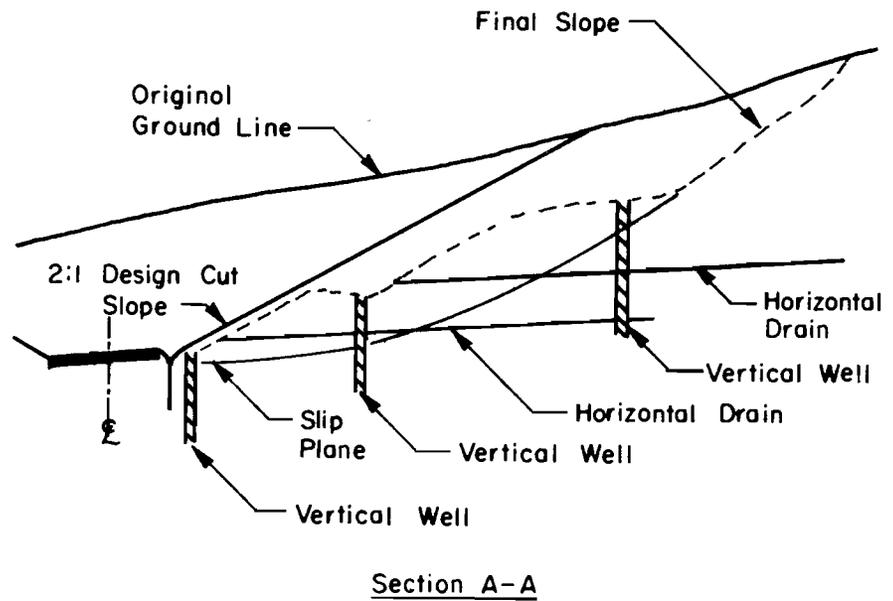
Cross section of slide and drainage system - Willits Slide (Smith and Stafford, 1957).
